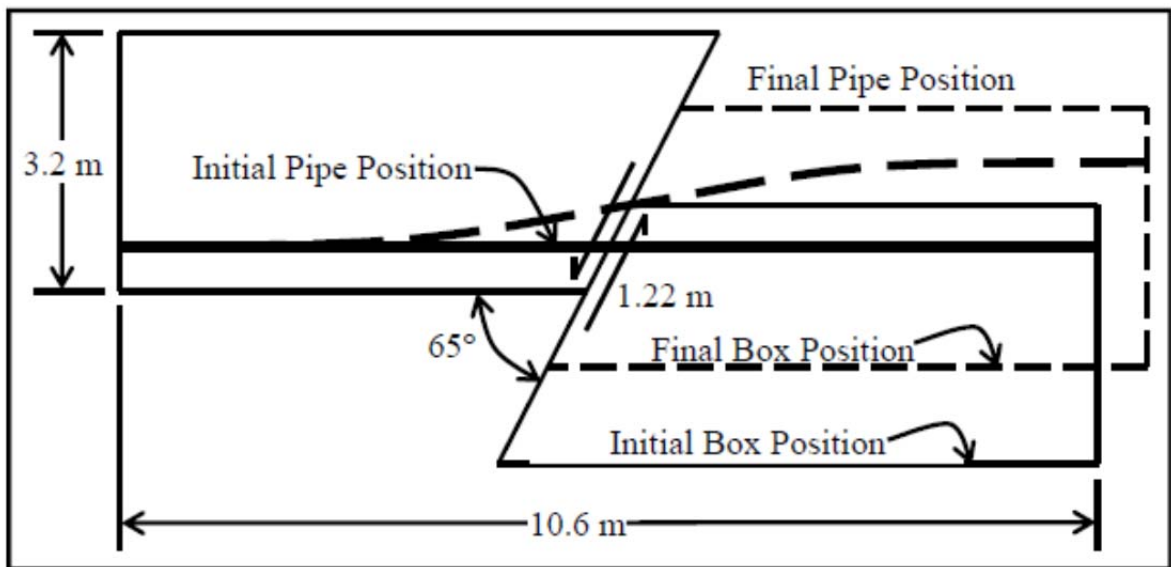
Plan View of Full Scale Pipeline Test.
